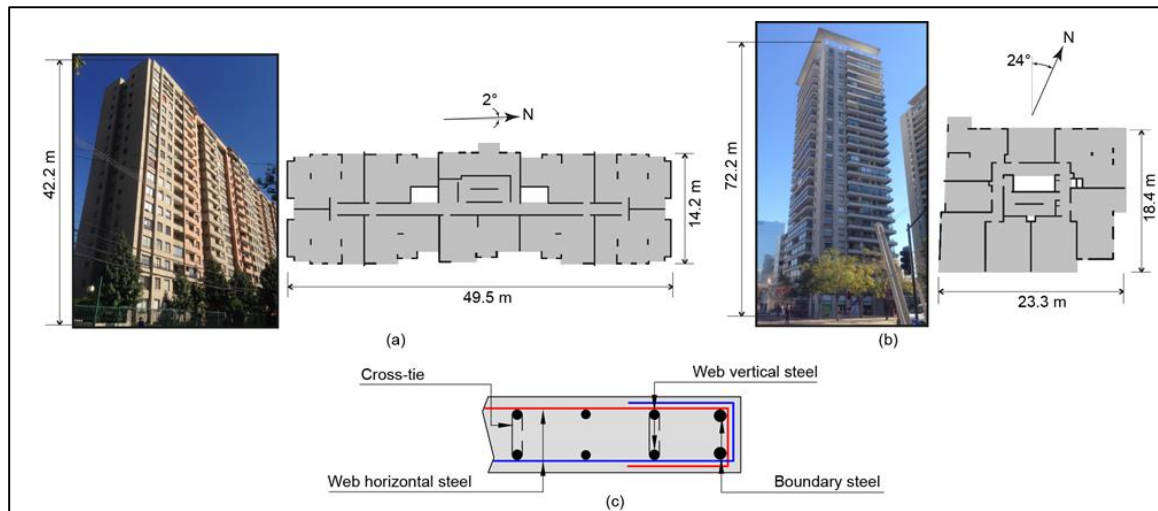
(a) Picture and plan view of 17-story building; (b) Picture and plan view of the 26-story building; (c) Typical detailing at boundaries of RC shear walls
